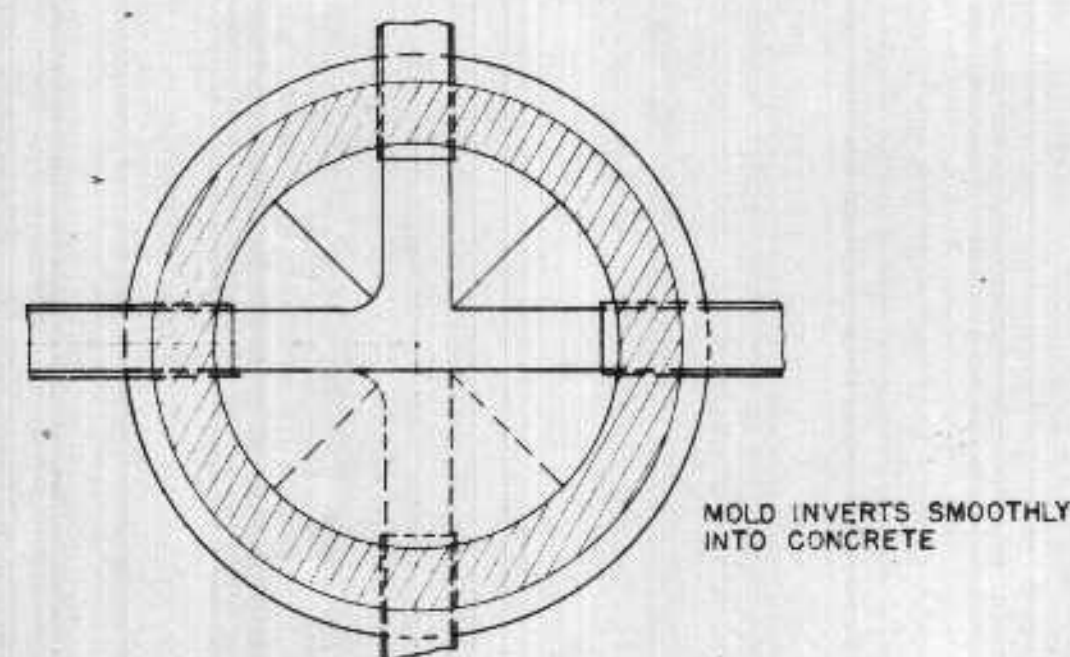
DETAIL OF MANHOLE - SEWER STRAIGHT THROUGH
